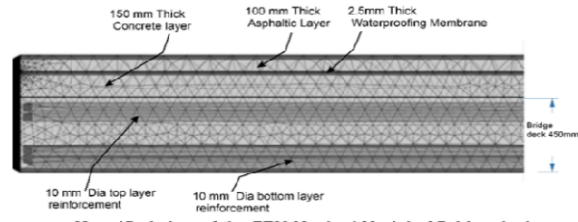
FEM model of bridge deck with waterproofing membrane with asphalt layer overlay
